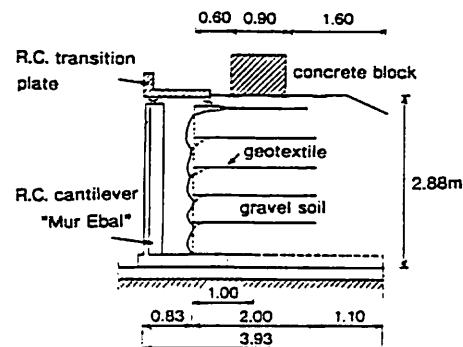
Pre-cast full-height concrete panel facing separated from the wrapped-around wall face of GRS-RW : Model for loading test (Thamm et al., 1990, see Fig. 6.9 for the wall after loading).
